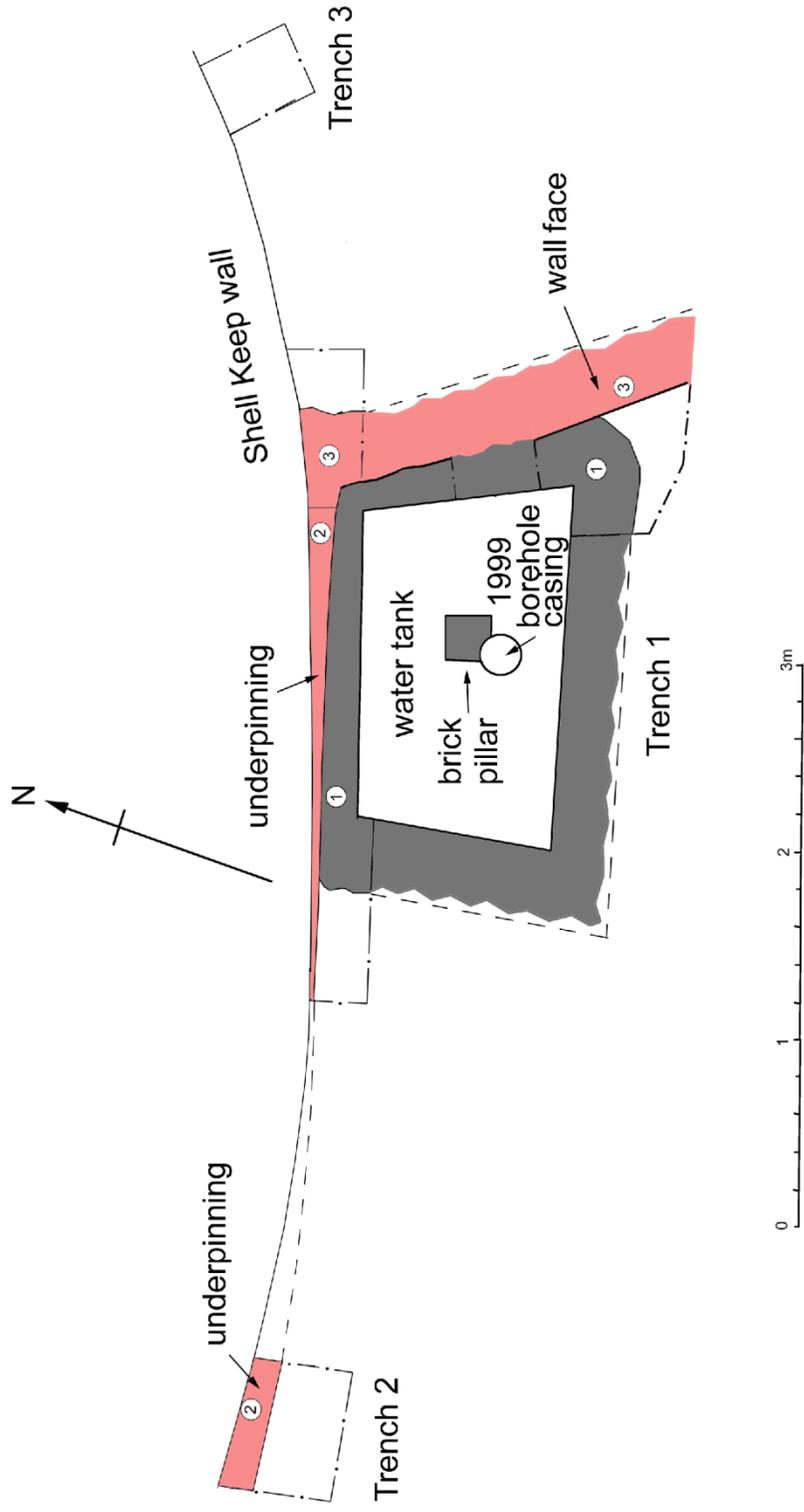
Plan showing excavation trenches, water tank and post-medieval walls
